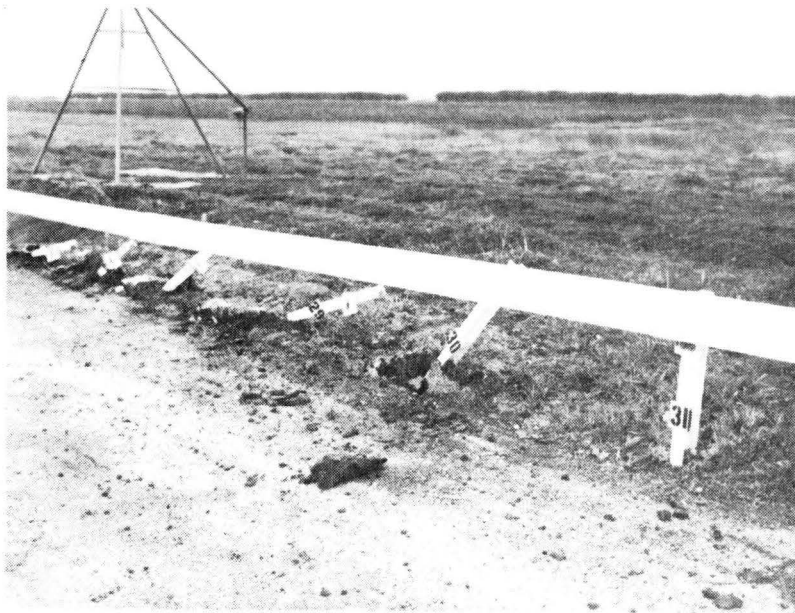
, Damaged Guardrail, Test NY-A.
